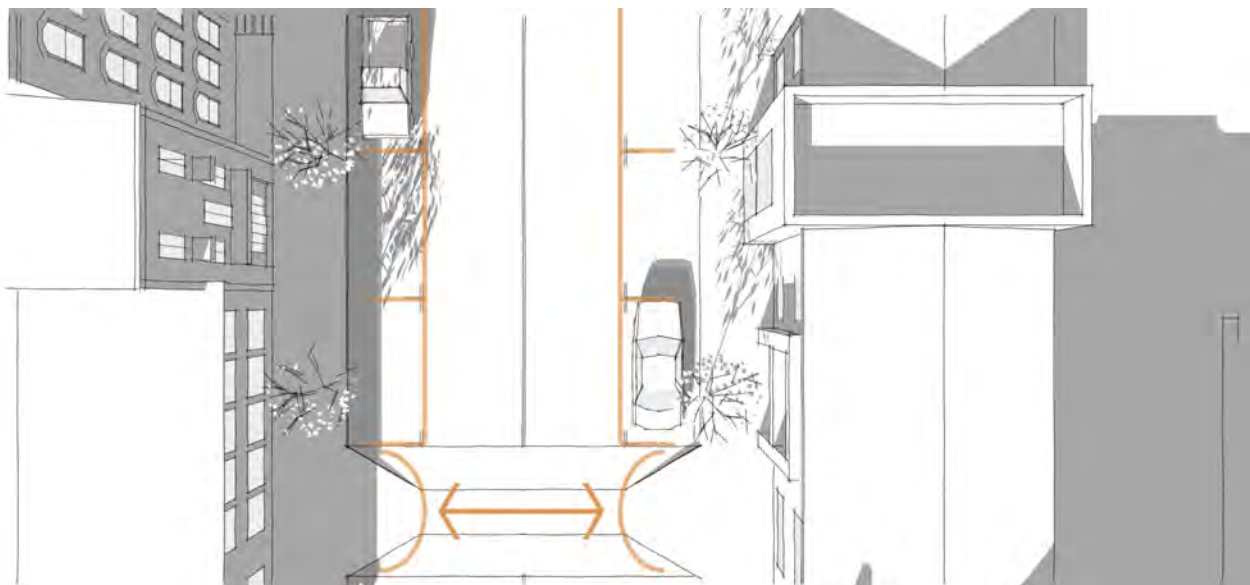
9: On-street parking spaces can be combined with crosswalks, bulbouts, and other traffic calming measures to slow down traffic on quieter streets.
